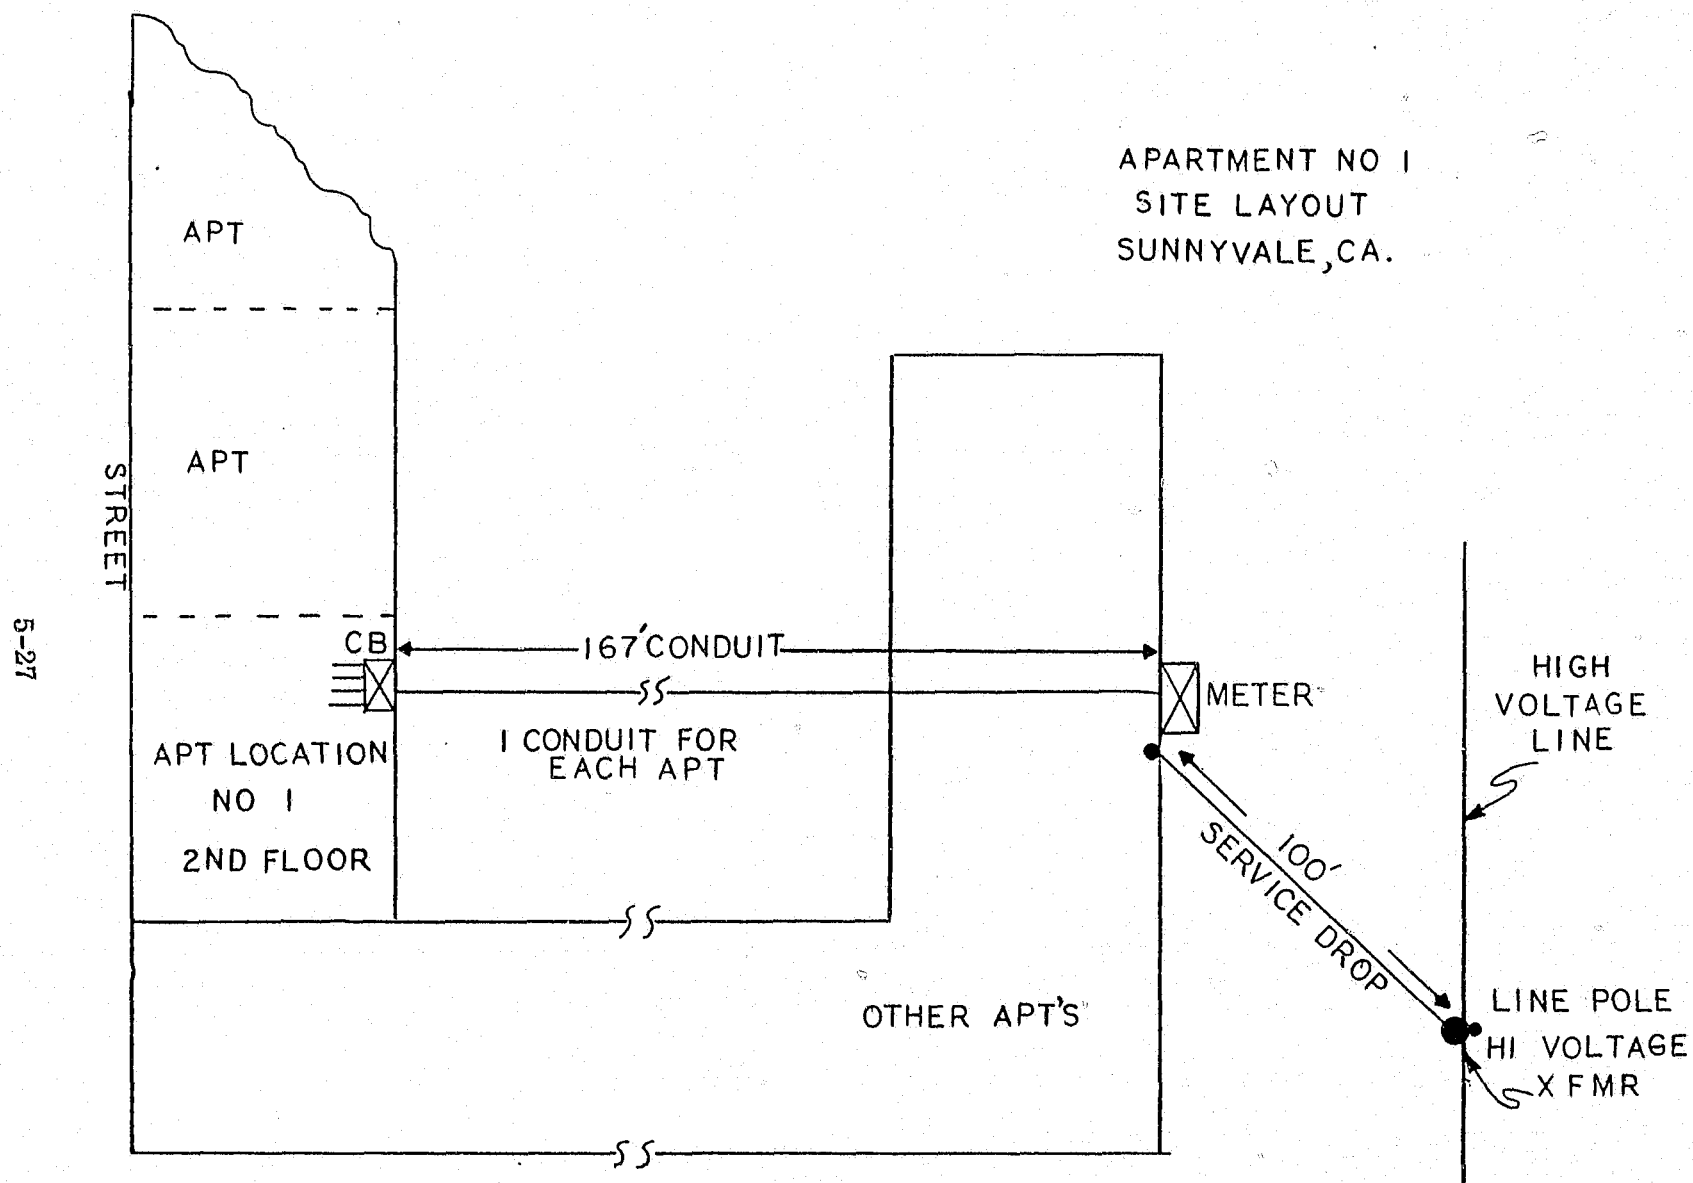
Apartment No. 1 Site Layout, Sunnyvale
